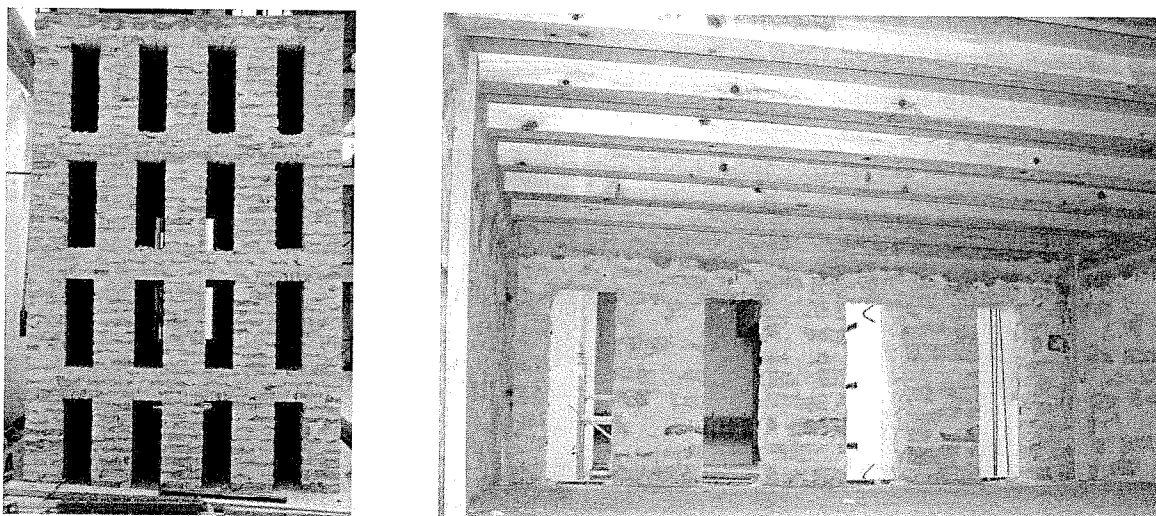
Experimental model of an URM building with flexible floor diaphragm
